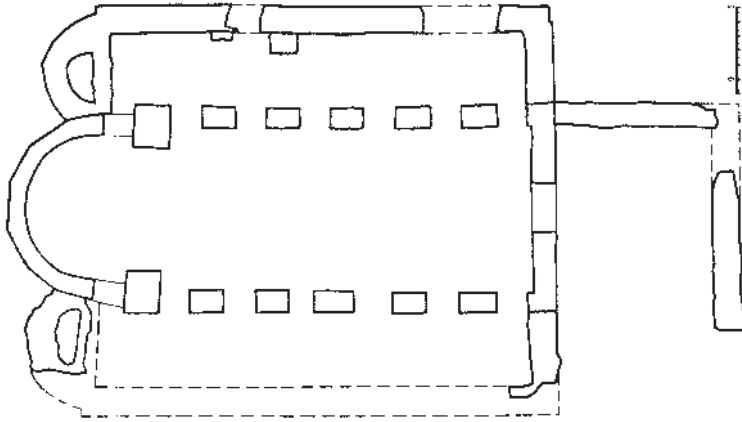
Alakhadzy: plan of first basilica (church no. 1).
